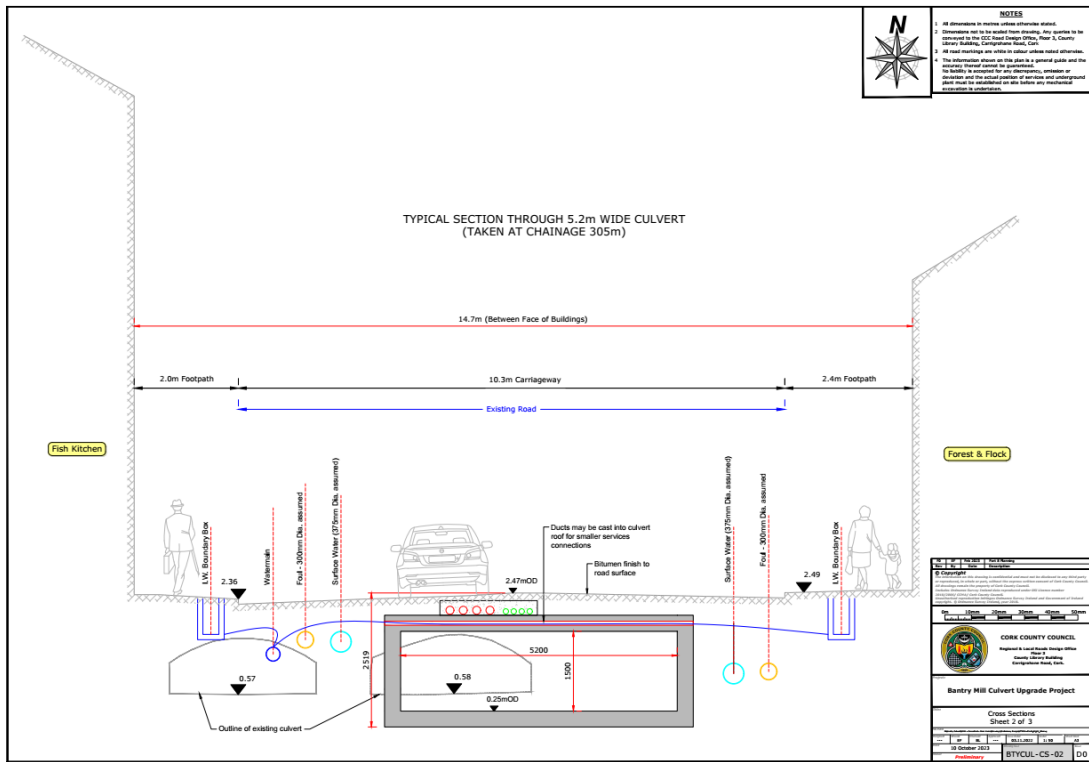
Proposed Bantry Mill Culvert Upgrade Project Sections
